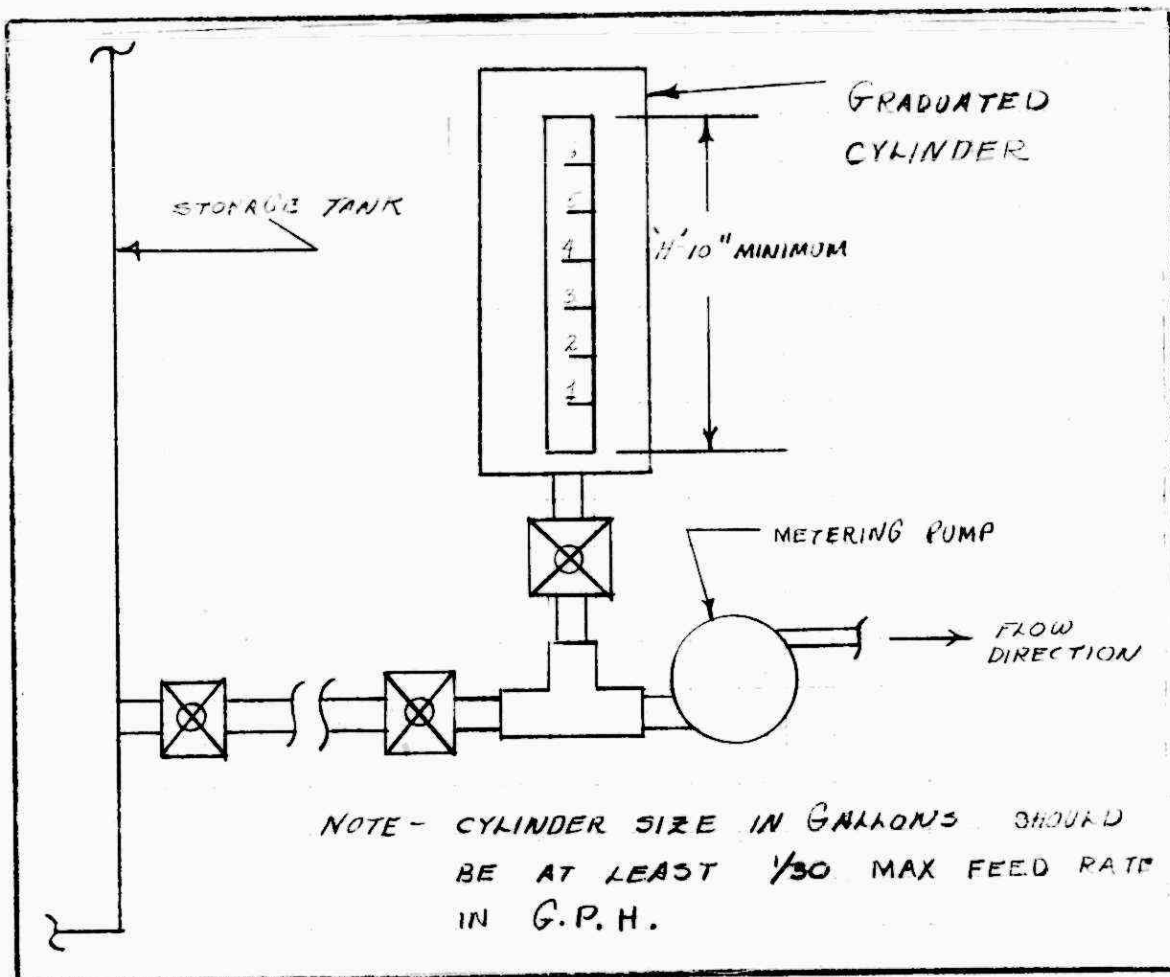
Metering Pump - Flow Indicator and Pump Calibrator.
